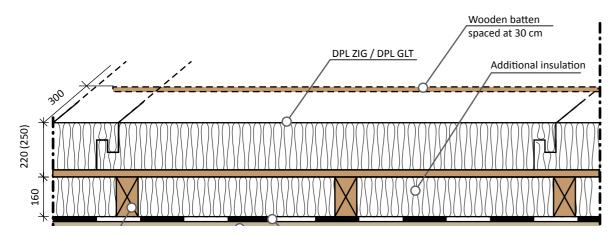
Fig. B Horizontal section through the roof plane with additional rafter insulation.
